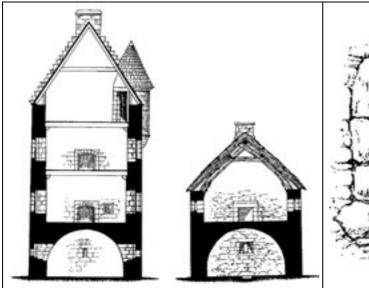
Typical tower house; Fourmerkland Tower on left, and typical bastle house section on right.
